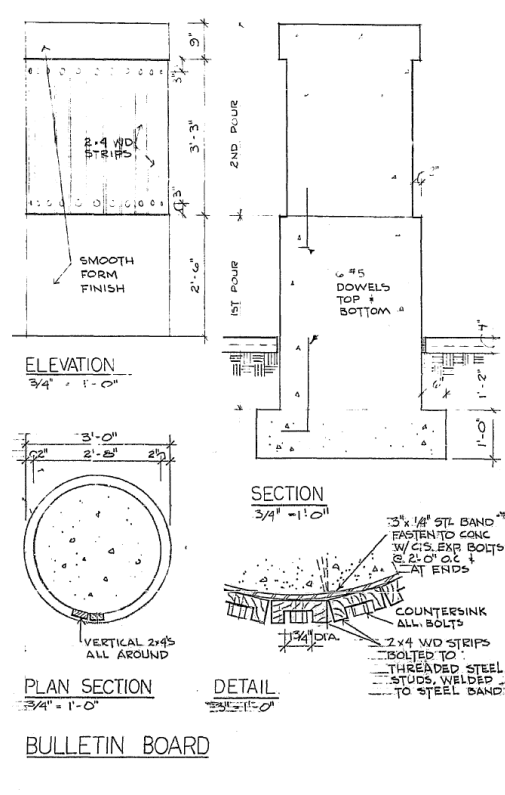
Bicentennial-era plans for Section E called for the creation of a community bulletin board outside the skating pavilion. It consisted of a cast-in-place concrete cylinder with vertical wooden slats. (Excerpt from Sheet 19, ETIC 831_41018A)
